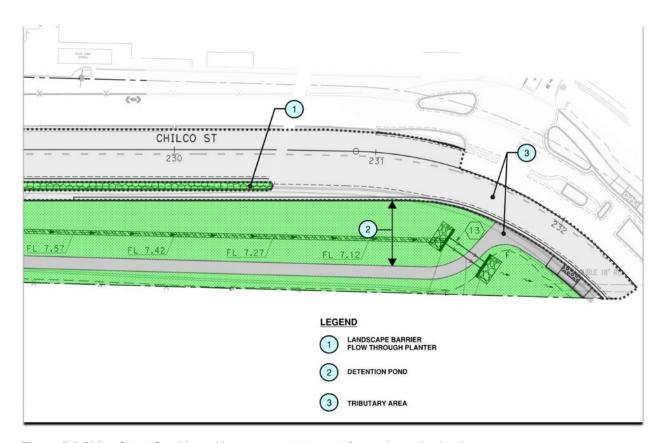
Chilco Street Southbound Improvements (excerpt from schematic plans)
